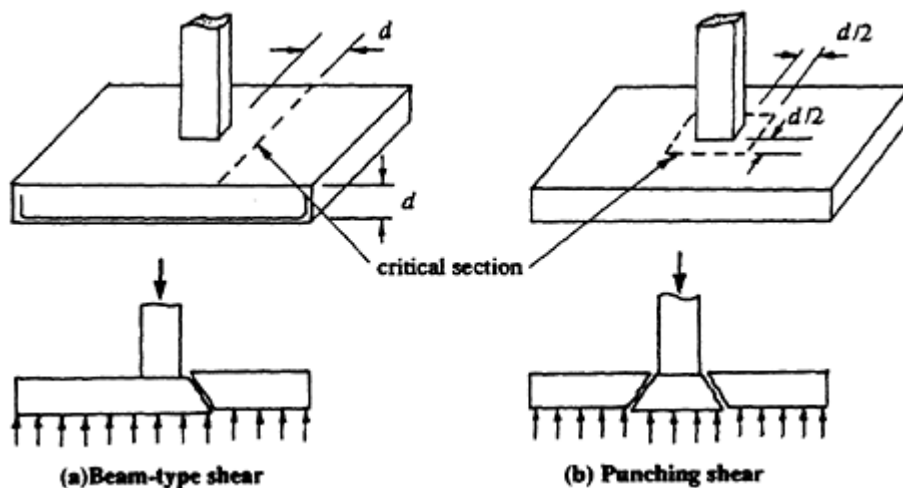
Shear failure surfaces in a footing or slab.
